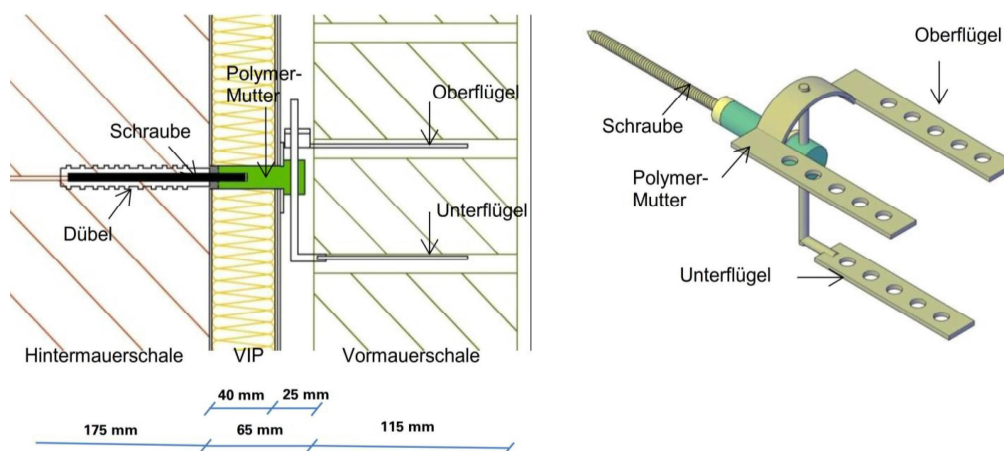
Anchor-Design installed in VIP insulation system, section and 3D
